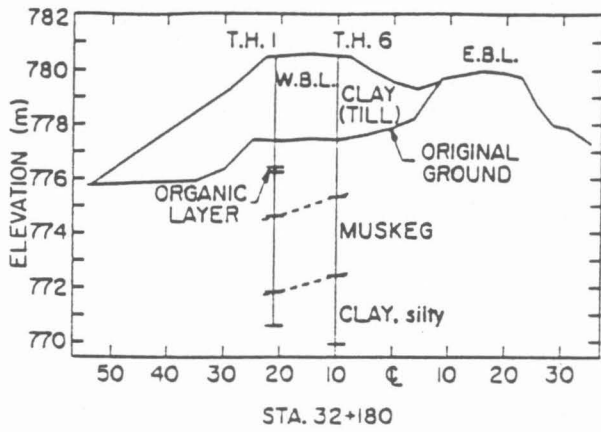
Cross-sectional Soil Profile Westbound Lane
